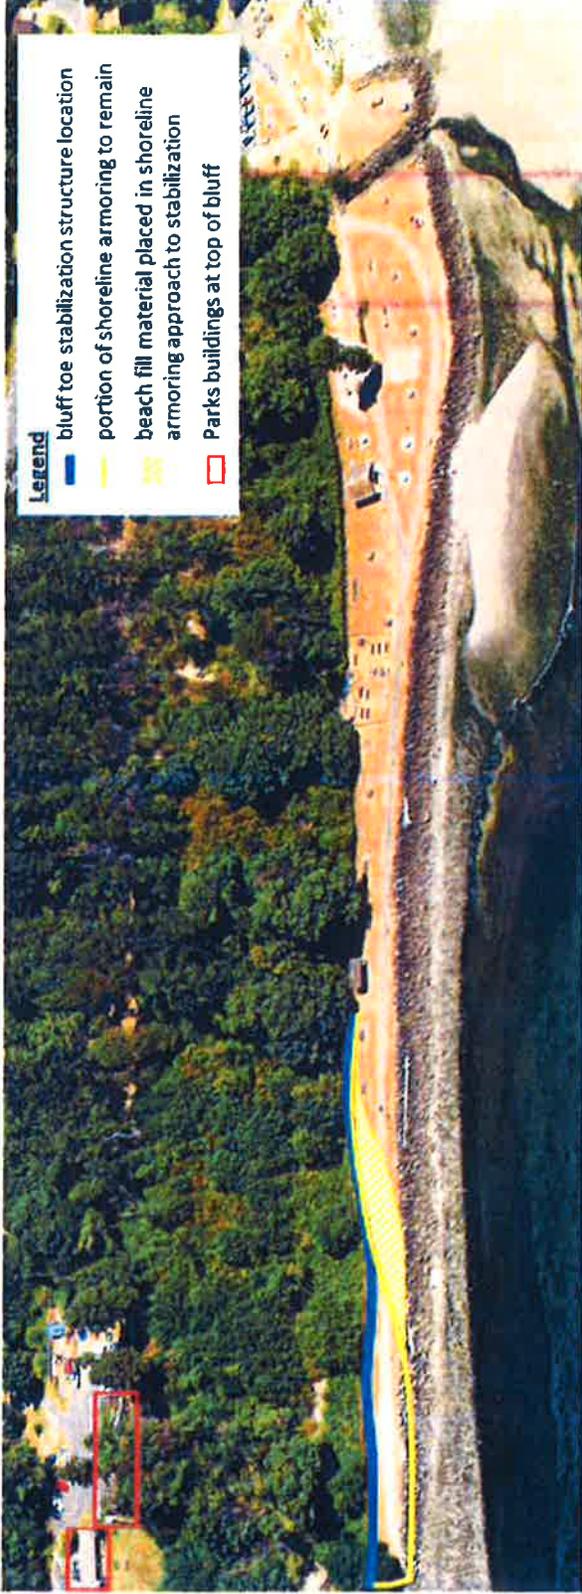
Two Shoreline Stabilization Approaches for Protecting Parks Buildings at Top of Bluff
